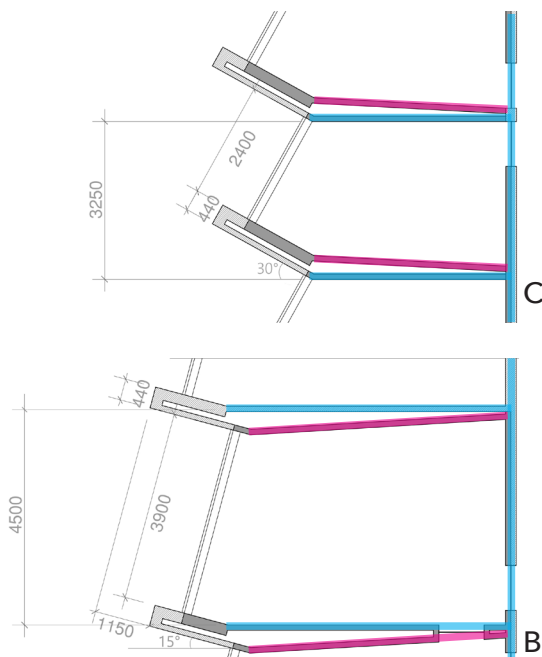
Double-layered load-bearing walls not to make parallel walls
